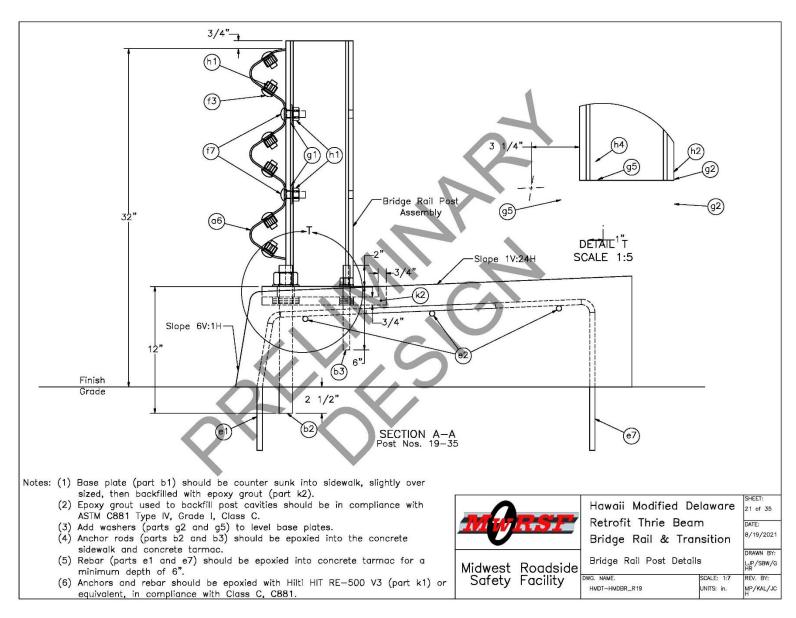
Bridge Rail Post Details, Test No. HMDT-1
